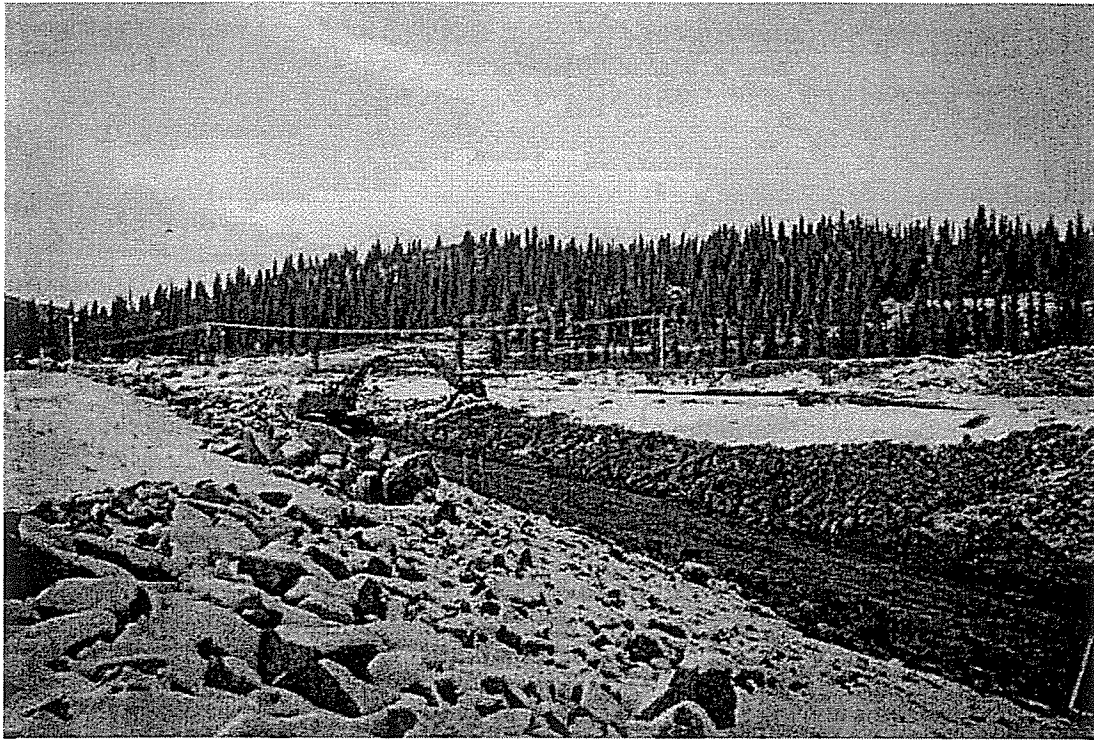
Hitachi hoe pulling riprap down on the north side of the spillway
